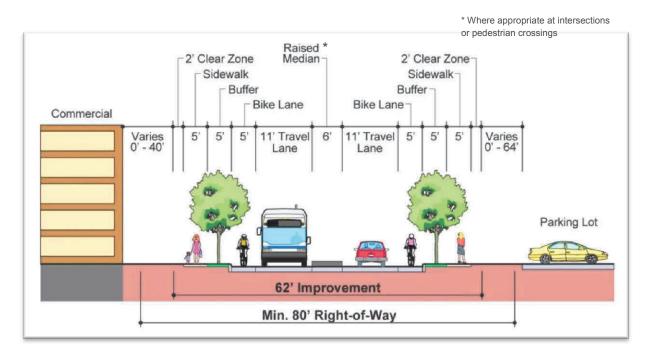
Typical Section from the rail overpass to Camp Meade Road (MD 170) - (Segment 1)
